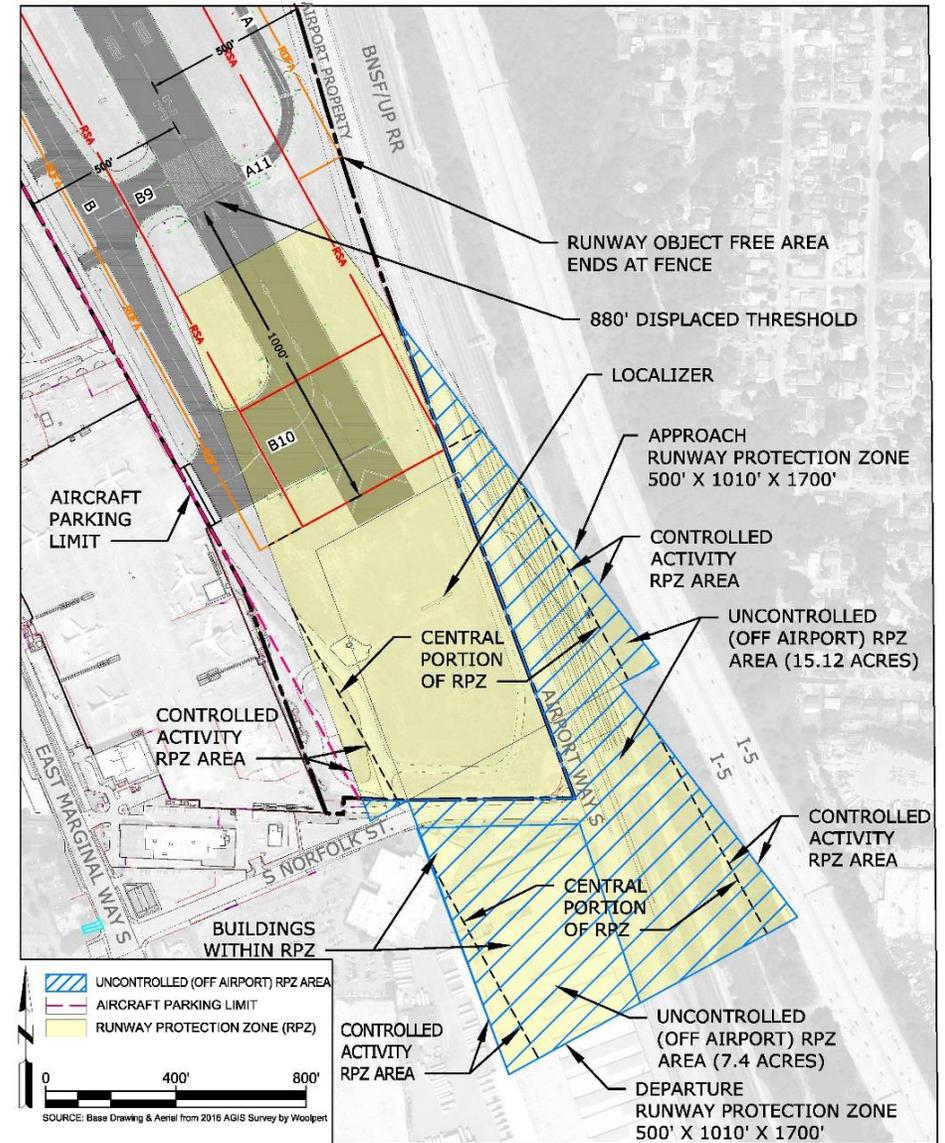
RUNWAY 32L INSTRUMENT APPROACH PROCEDURE/ RUNWAY PROTECTION ZONE DETAIL (Alternative One)
